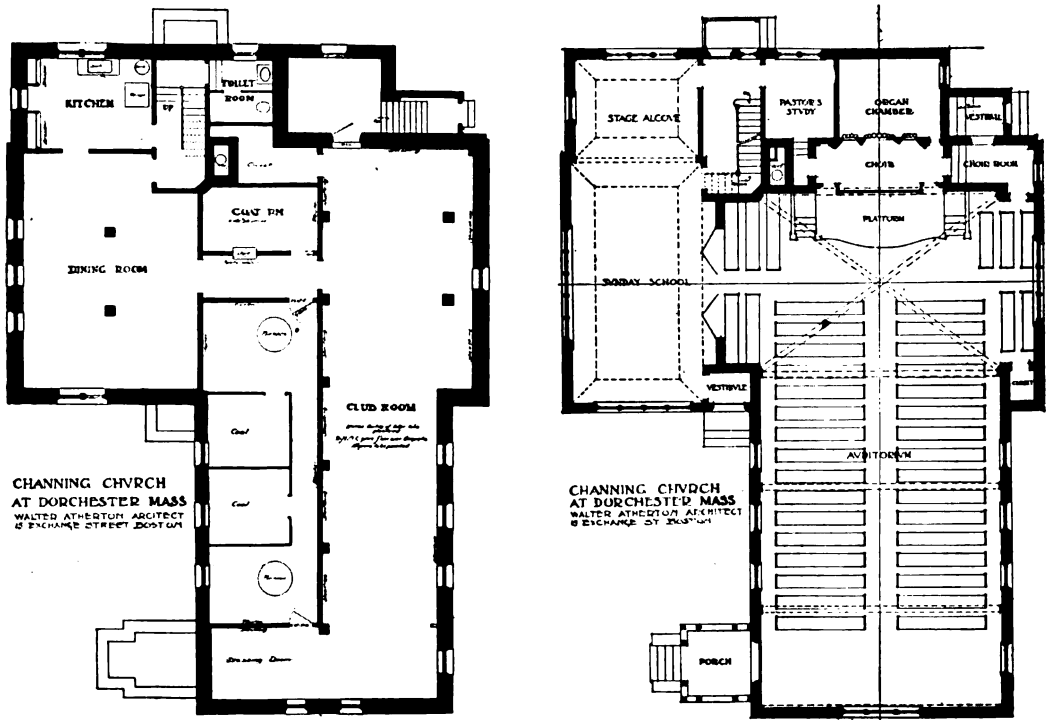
BASEMENT AND MAIN FLOOR—CHANNING CHURCH, DORCHESTER, MASS.
